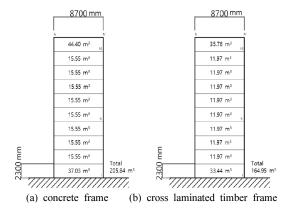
Insulation volume required for a 10 story passive apartment house (floor area: 105.27 m², applied insulation thickness and envelops composition for concrete frame: Table 4 and Fig. 2, applied insulation thickness and envelops composition for CLT frame: Table 5 and Fig. 3).
